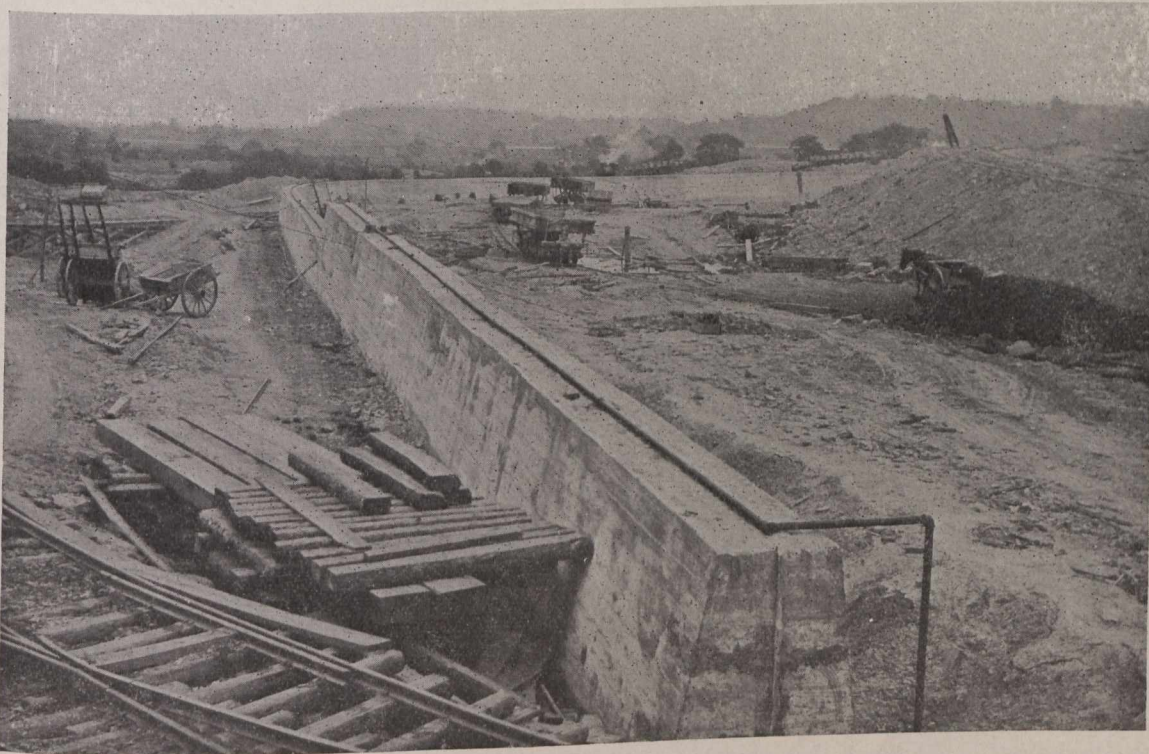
Core Wall of Dam at Head of Lock No. 6, Section 3.
